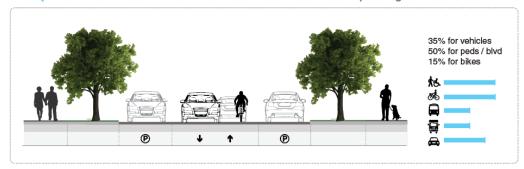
Proposed shared travel road in the 700 – 900 blocks
